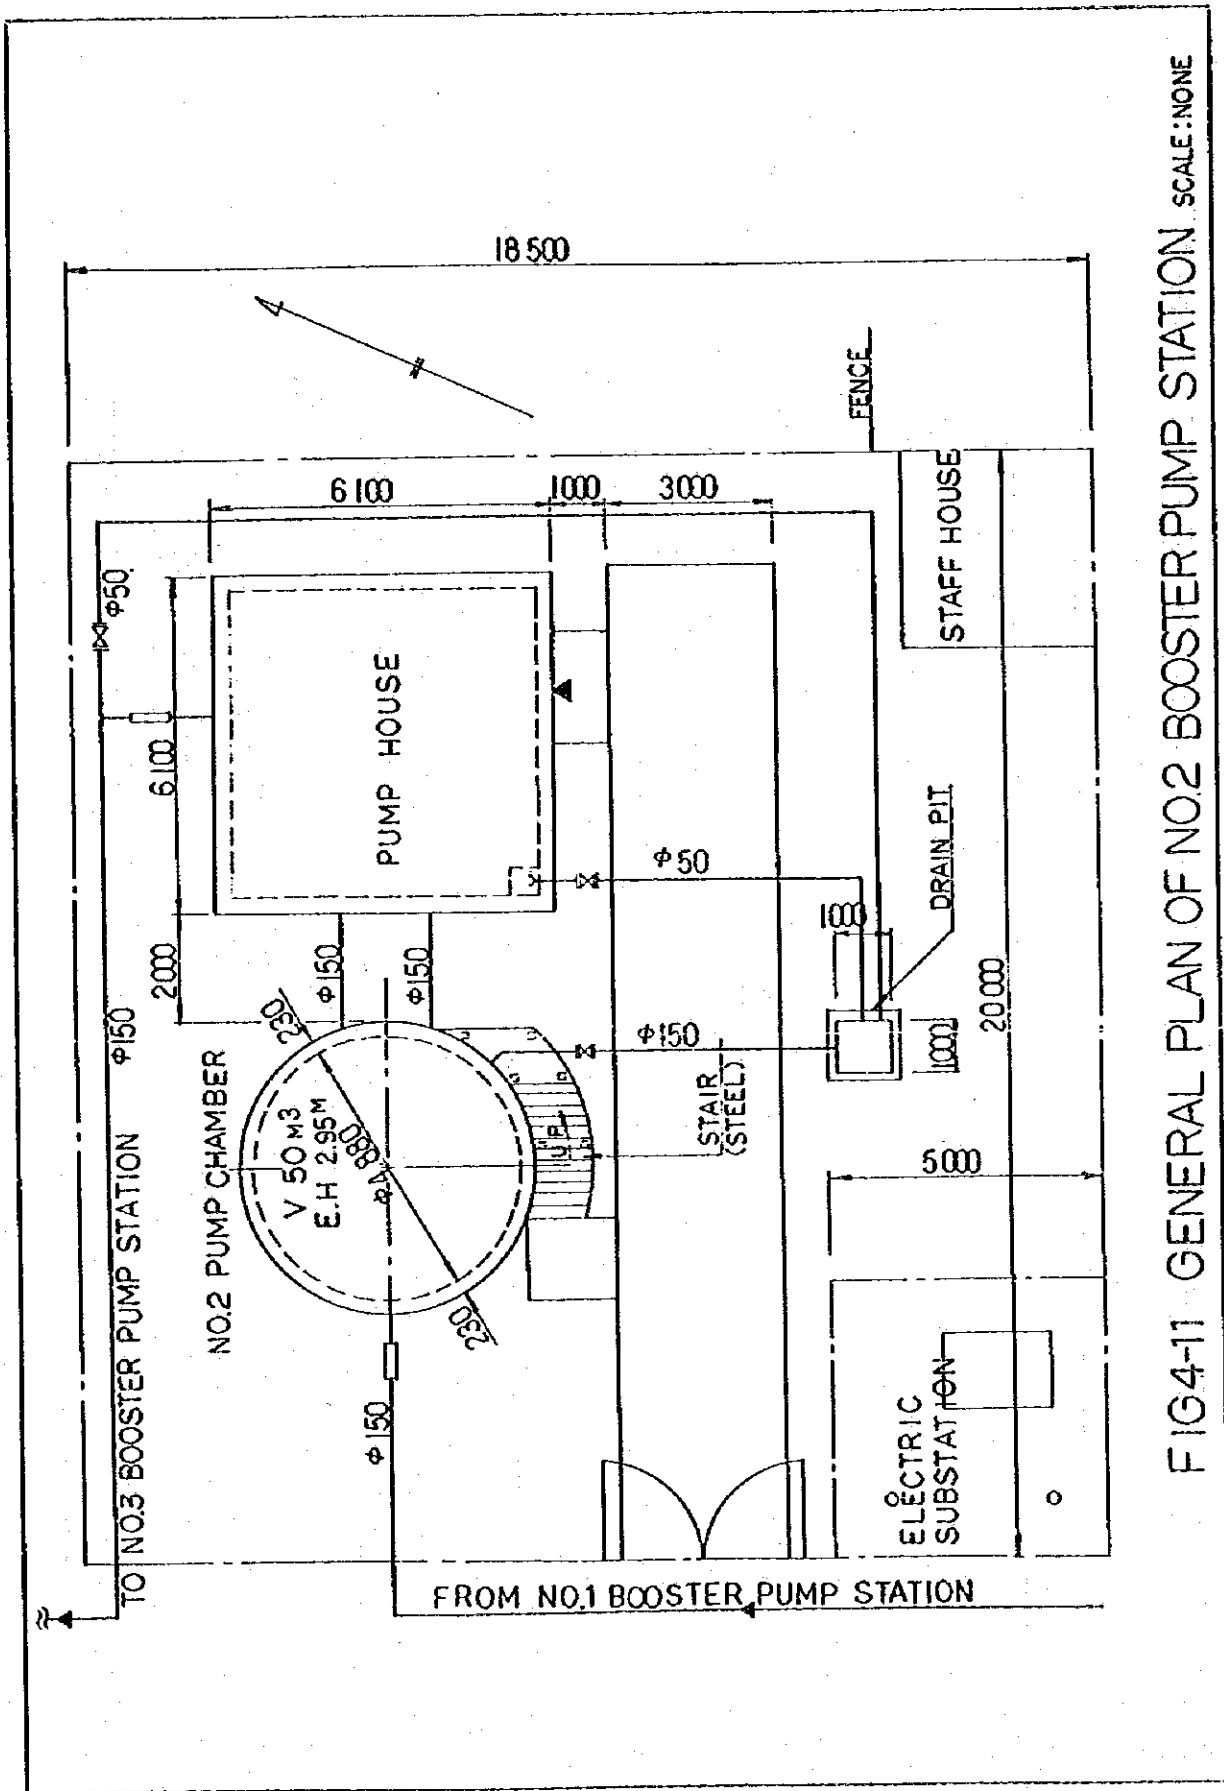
GENERAL PLAN OF NO.2 BOOSTER PUMP STATION. SCALE: NONE
